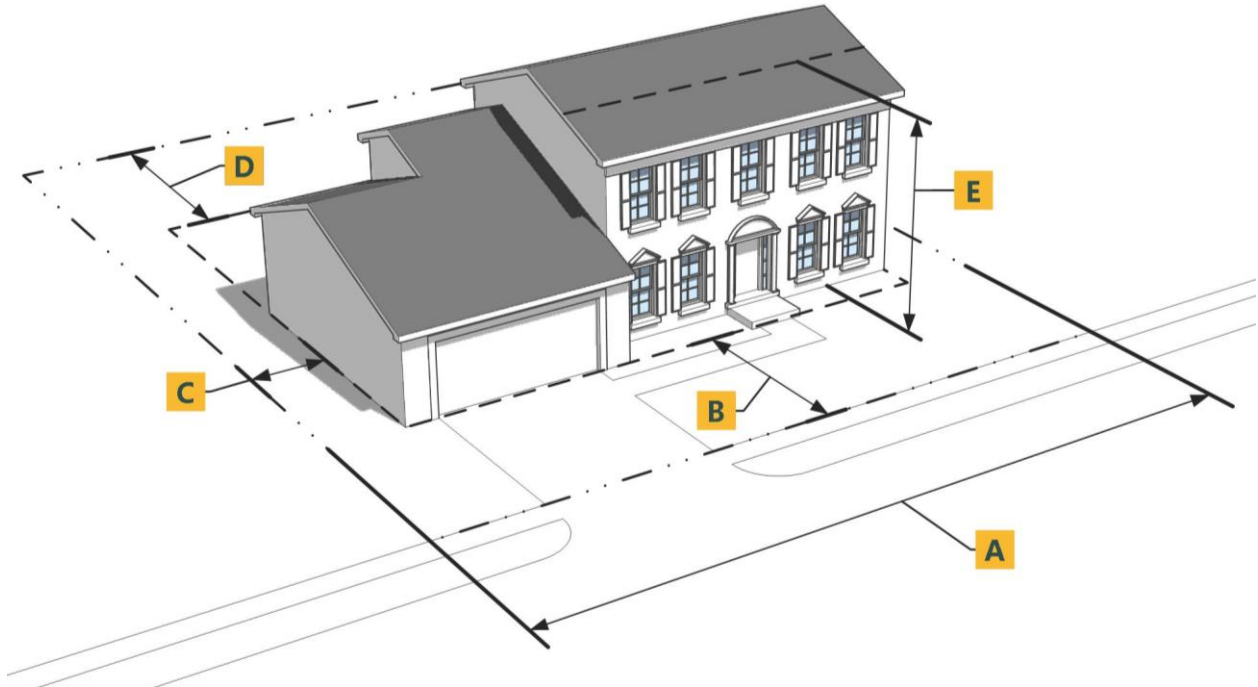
R-5 District Lot and Building Dimensional Standards
